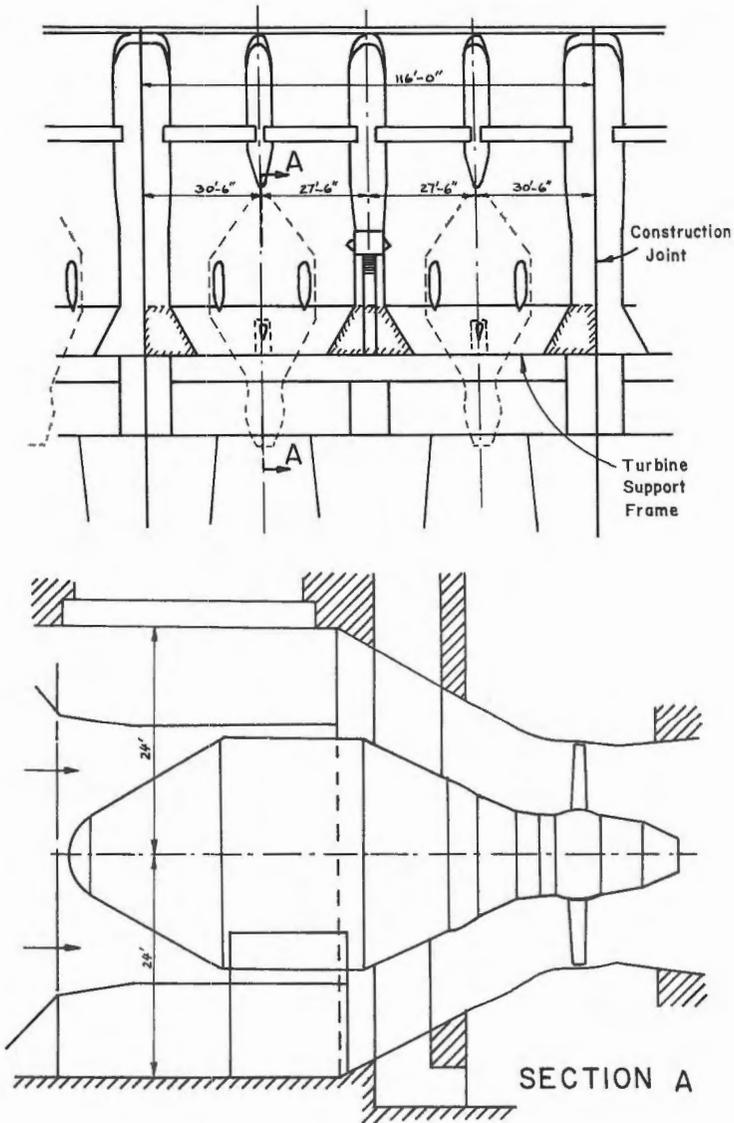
Plan View and Elevation of Bulb Turbines in Hydroelectric Plant Project
